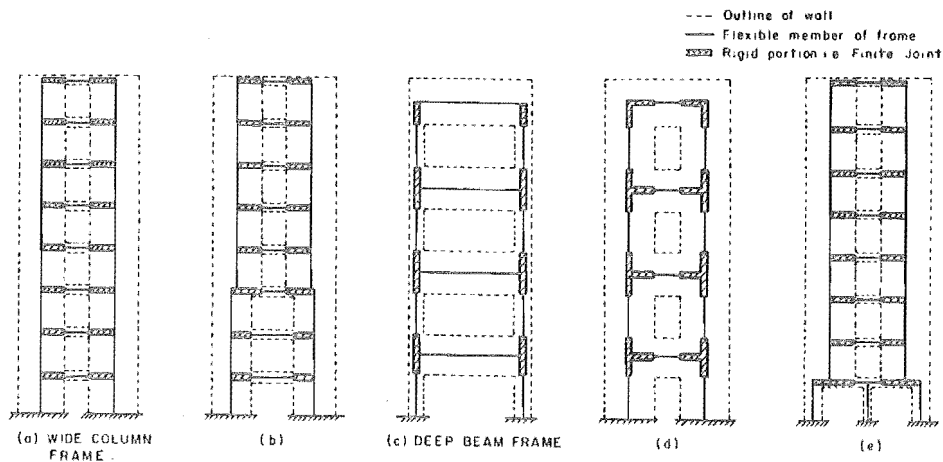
FRAMES WITH FINITE JOINTS⁴²
